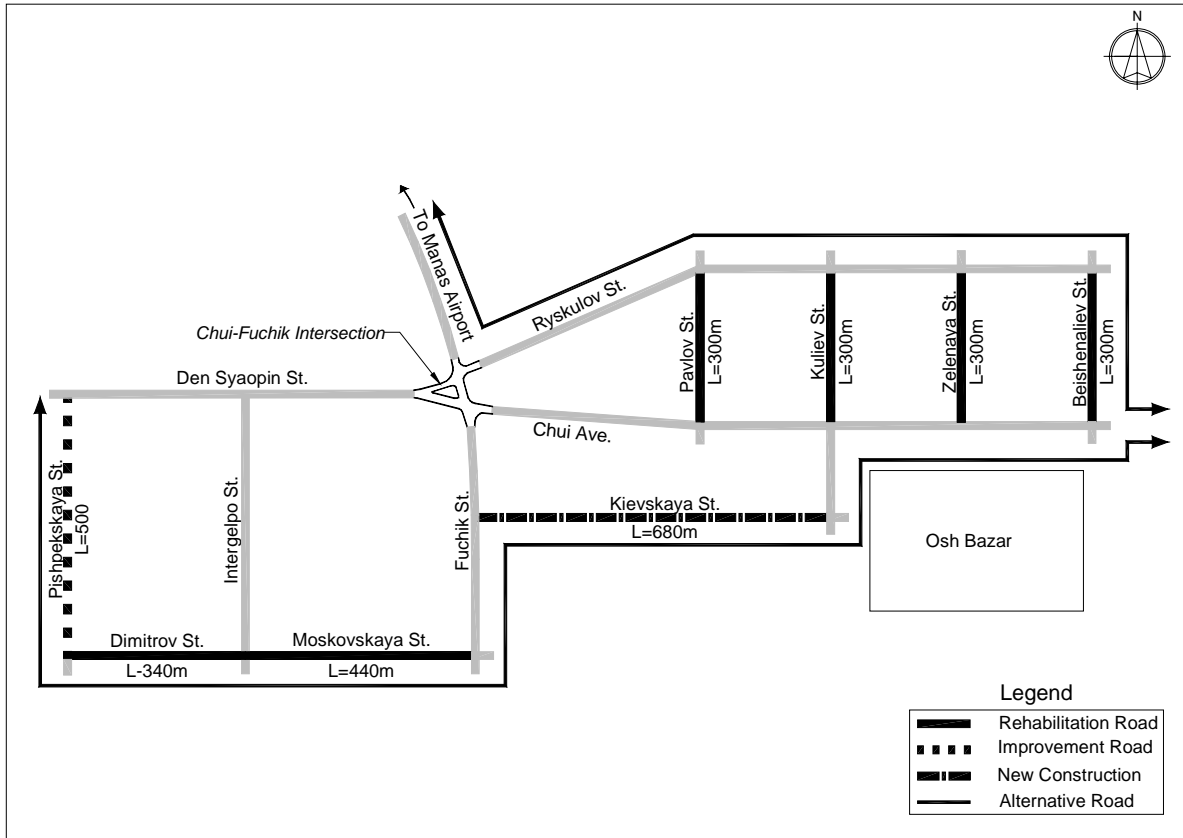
Road Network Condition around Chui-Fuchik Intersection
